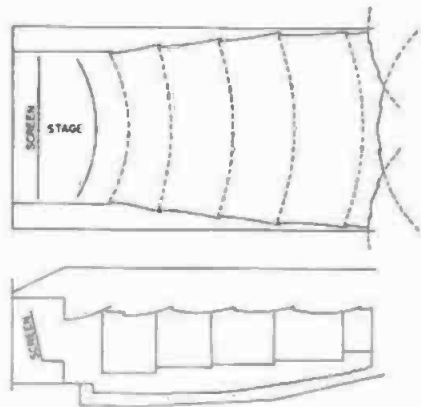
Recommended wall shapes for motion-picture theater construction.
